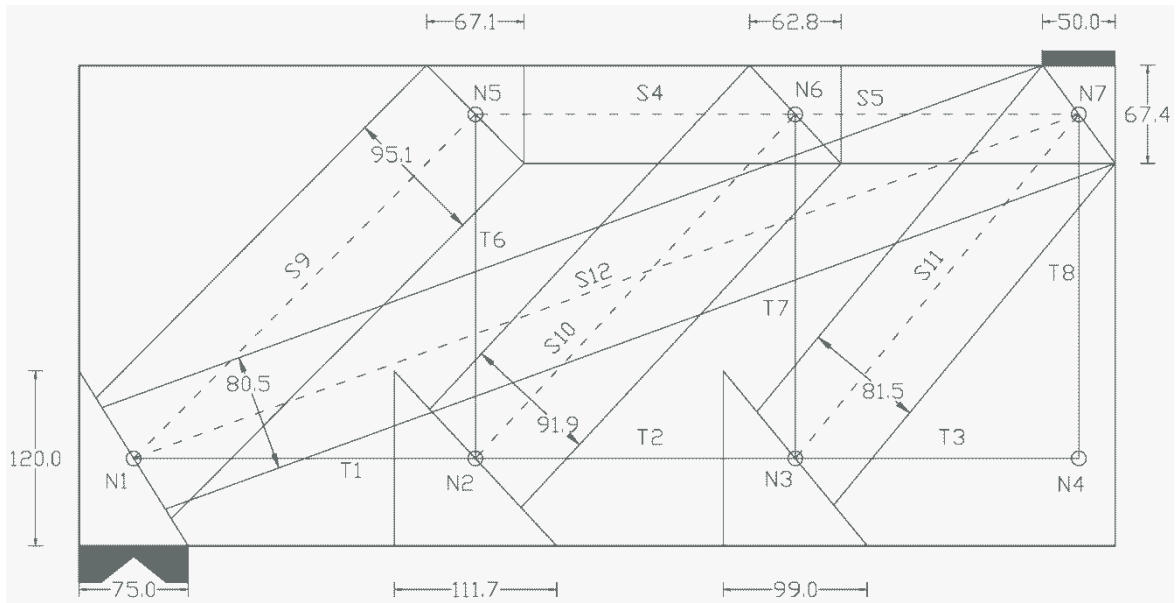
Centre-Line Geometry of the Strut-and-Tie Truss for beam BM25-220
